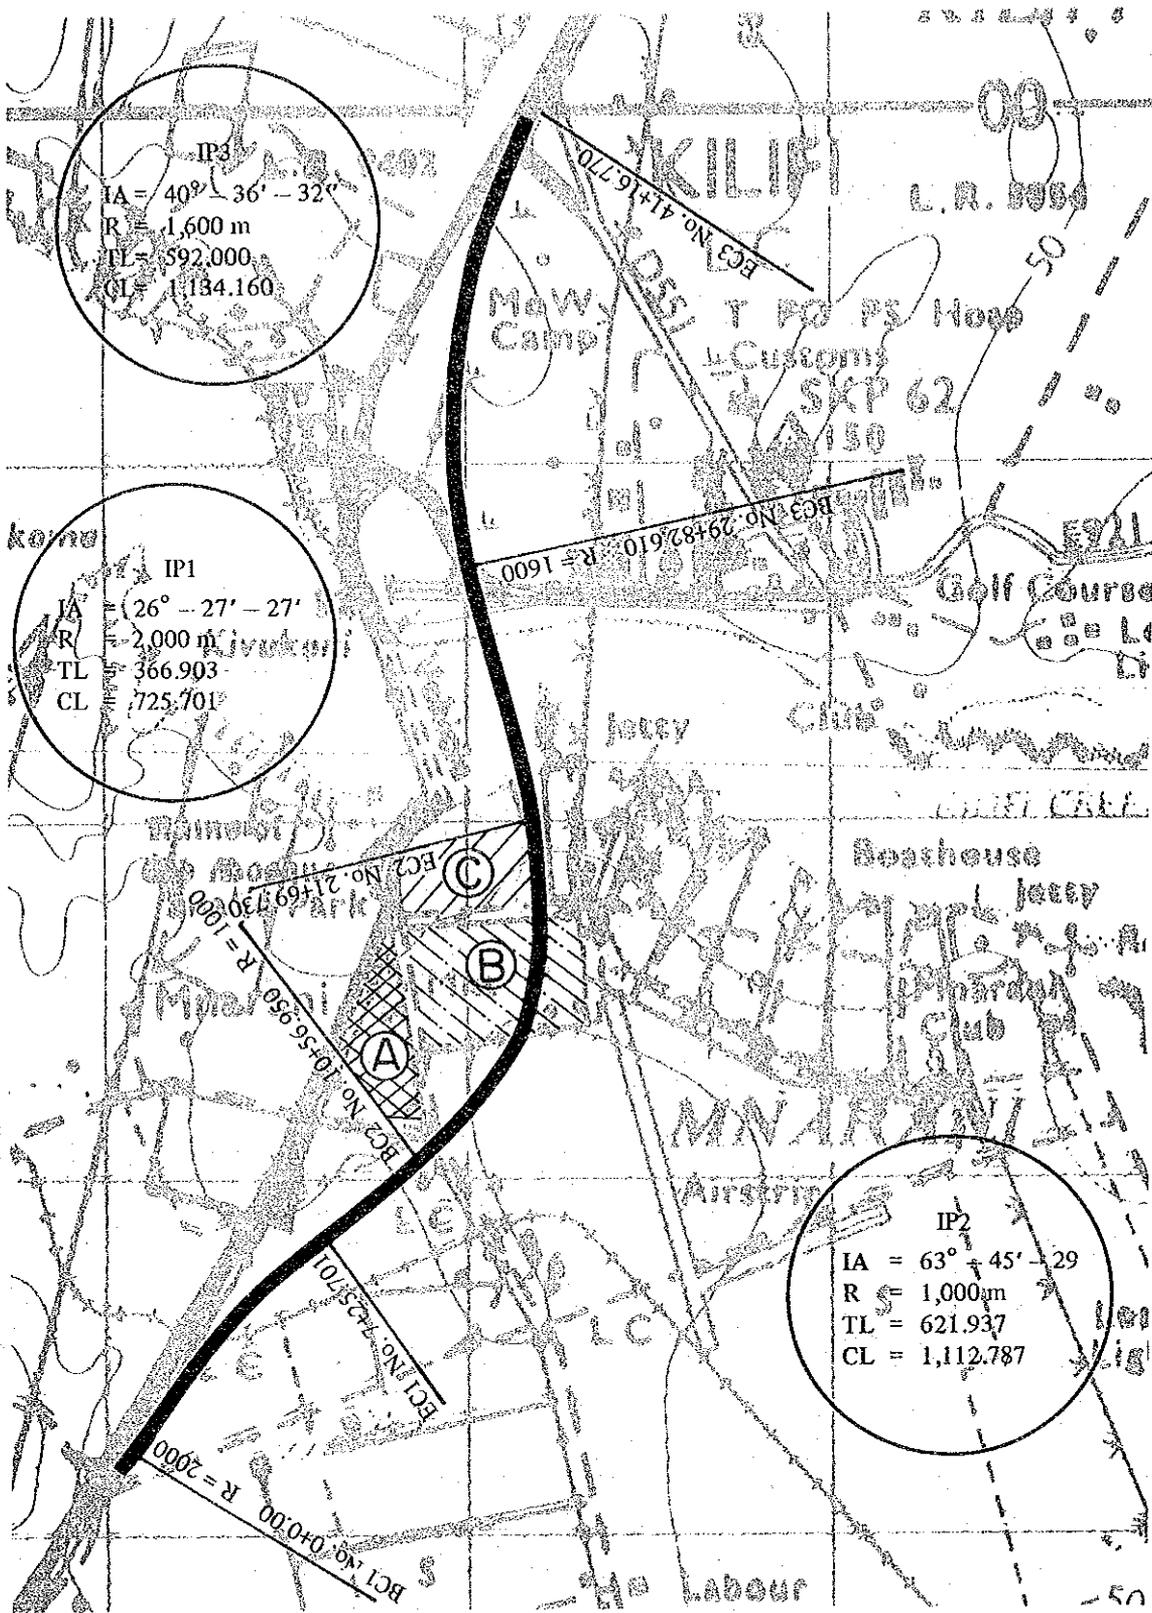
HORIZONTAL ALIGNMENT PLAN
